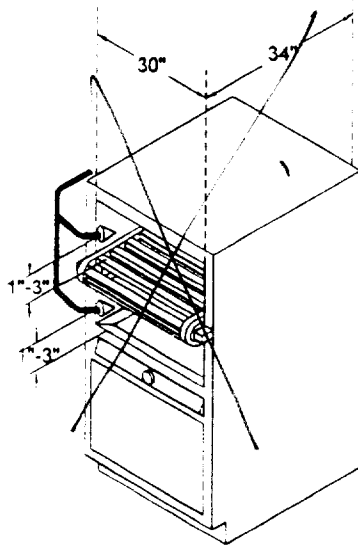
Model NL-UB Nozzle Placement, Closed Top Chain Broiler.
